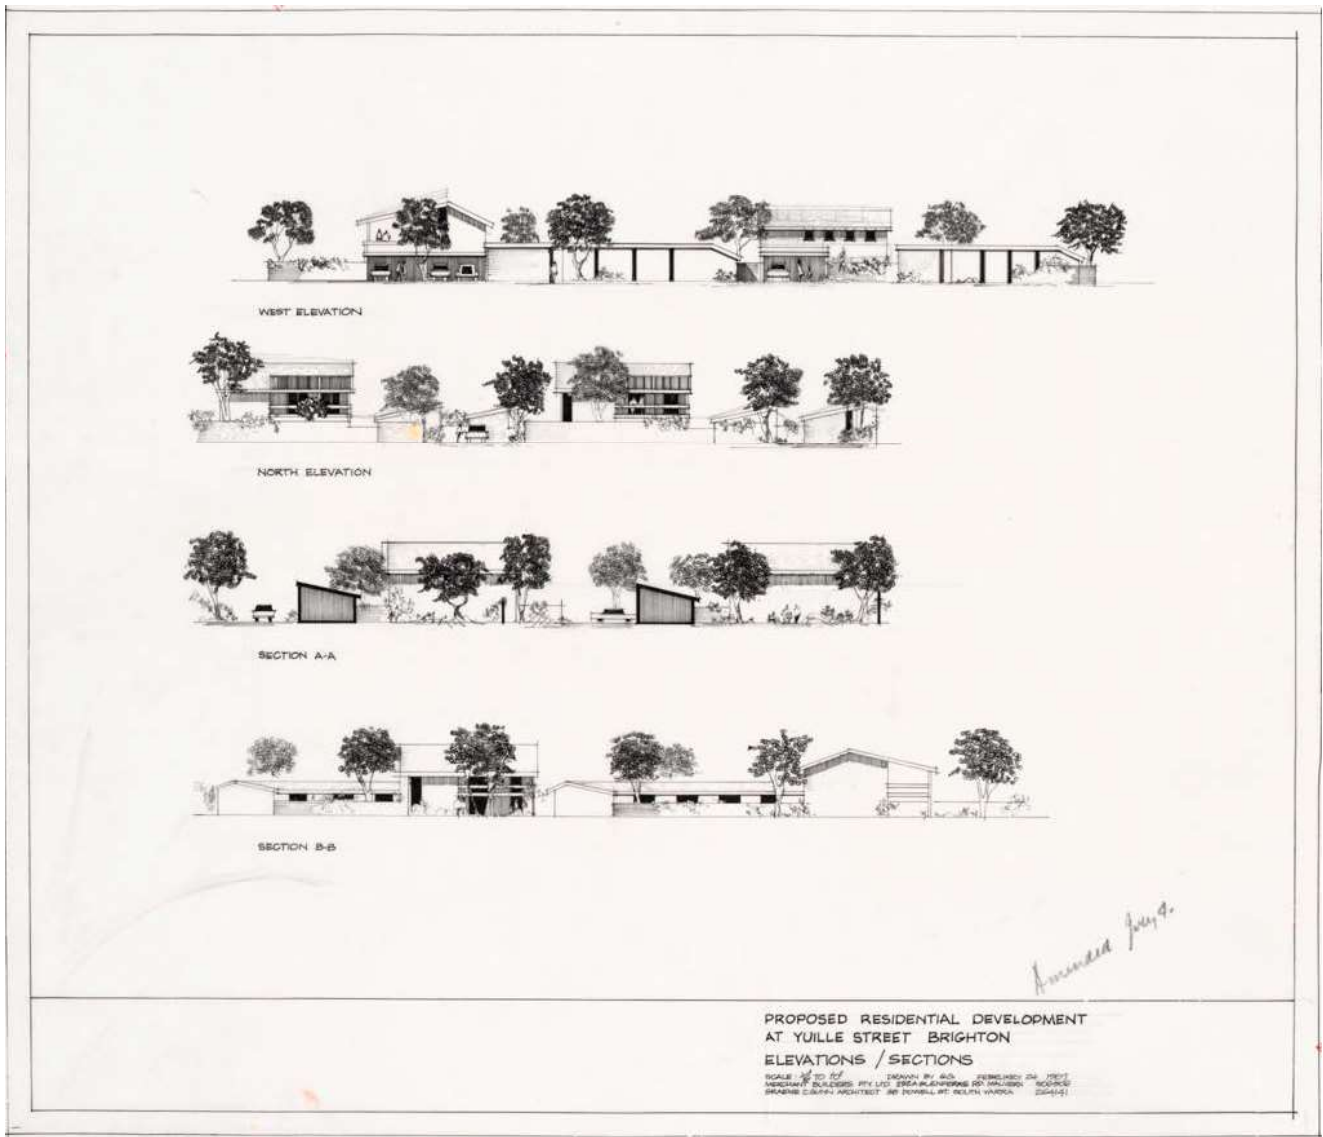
Proposed design for residential development at Yuille Street, Brighton (Source: Melbourne School of Design, Merchant Builders: towards a new archive, p 61).
